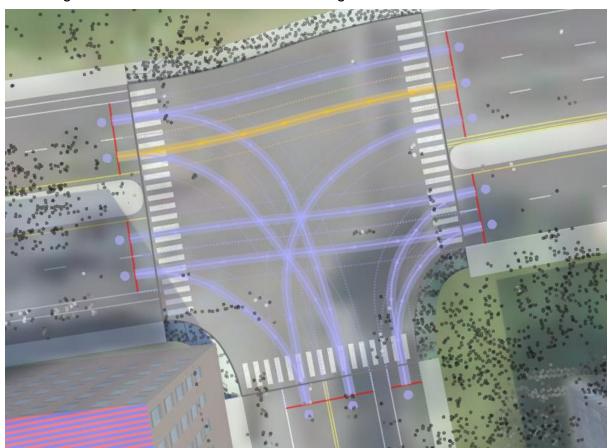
Road Connection Design at Albany & Neilson Street in RoadRunner
